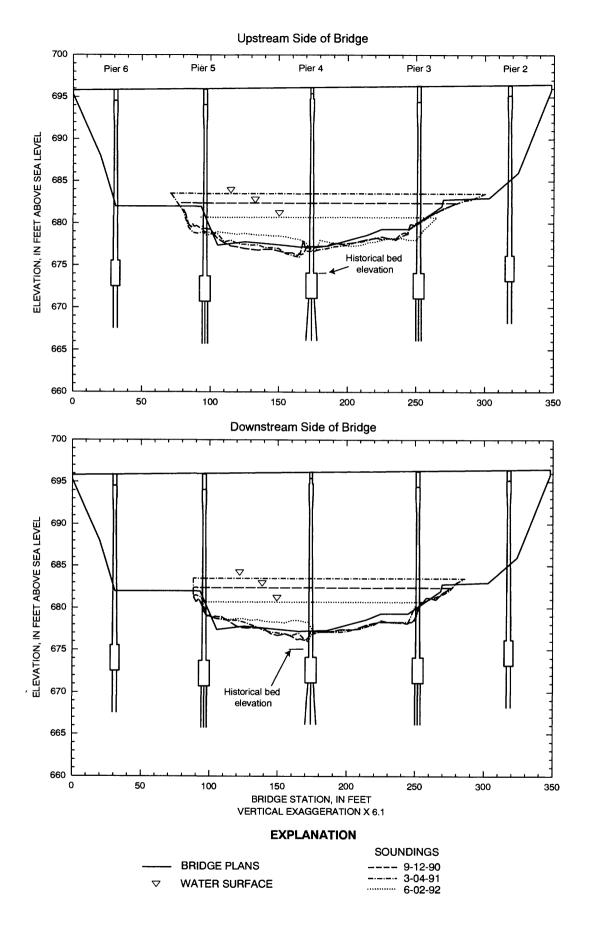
Cross sections showing bed elevations from bridge plans and soundings, State Road 14 over Tippecanoe River at Winamac, Indiana.
